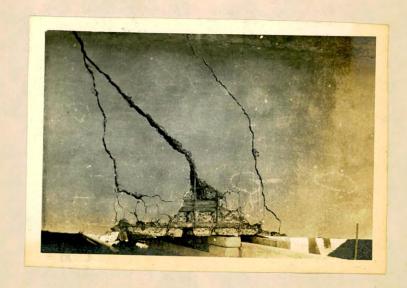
Mathabhanga Bridge (Cracks in the girder due to impact on falling)
